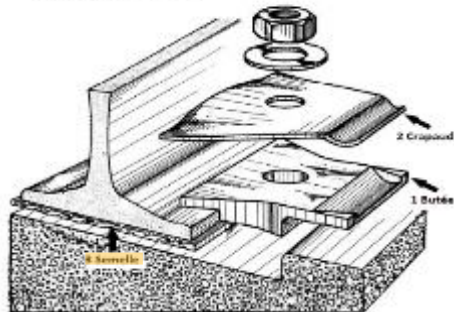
Drawing of a Nabla connection showing the position of the under rail pad
